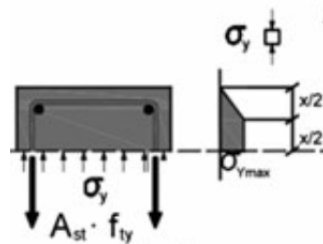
Confinement stresses introduced by the stirrups in the un-cracked concrete zone.
